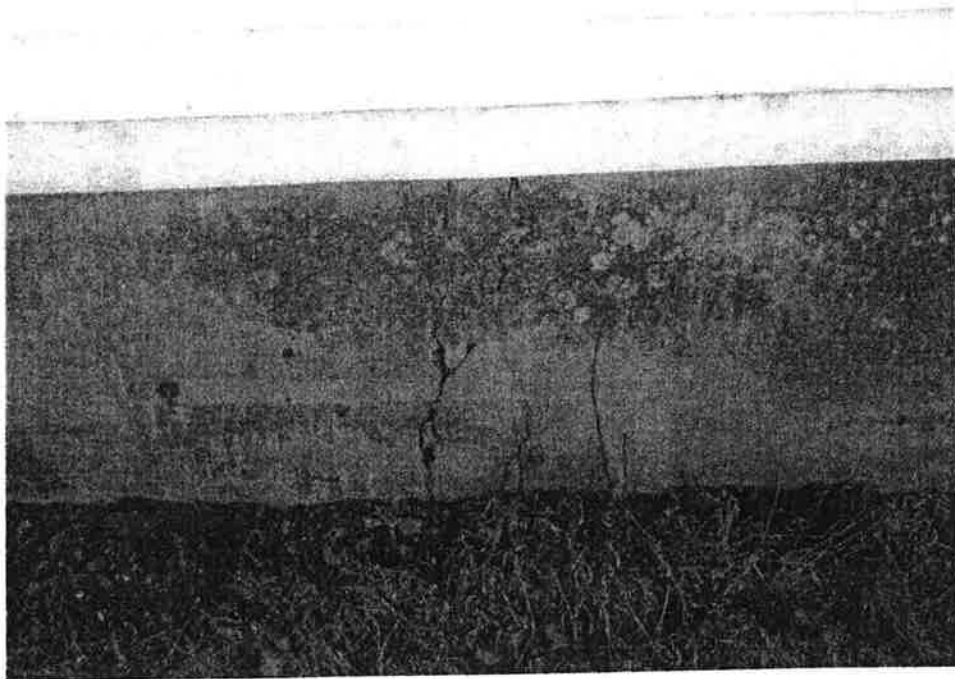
Cracks in Granite Foundation – South Side
